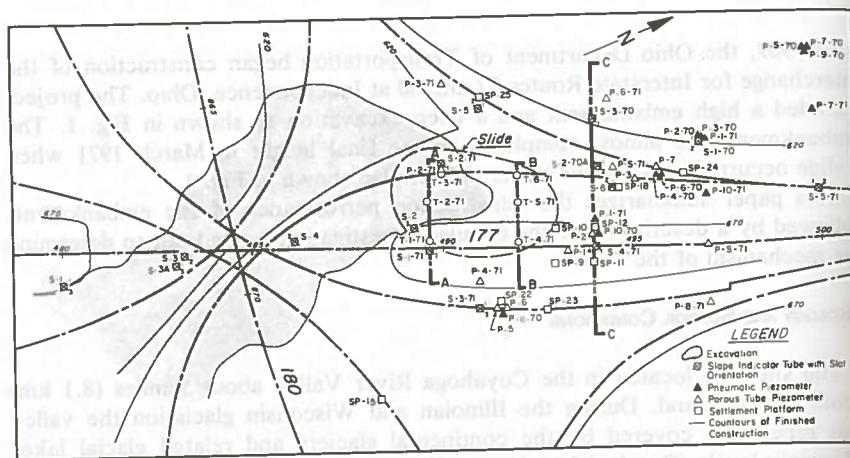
Location Plan (Station Numbers Are in 100 ft; Contour Elevations Are in feet) (1 ft = 0.305 m)
